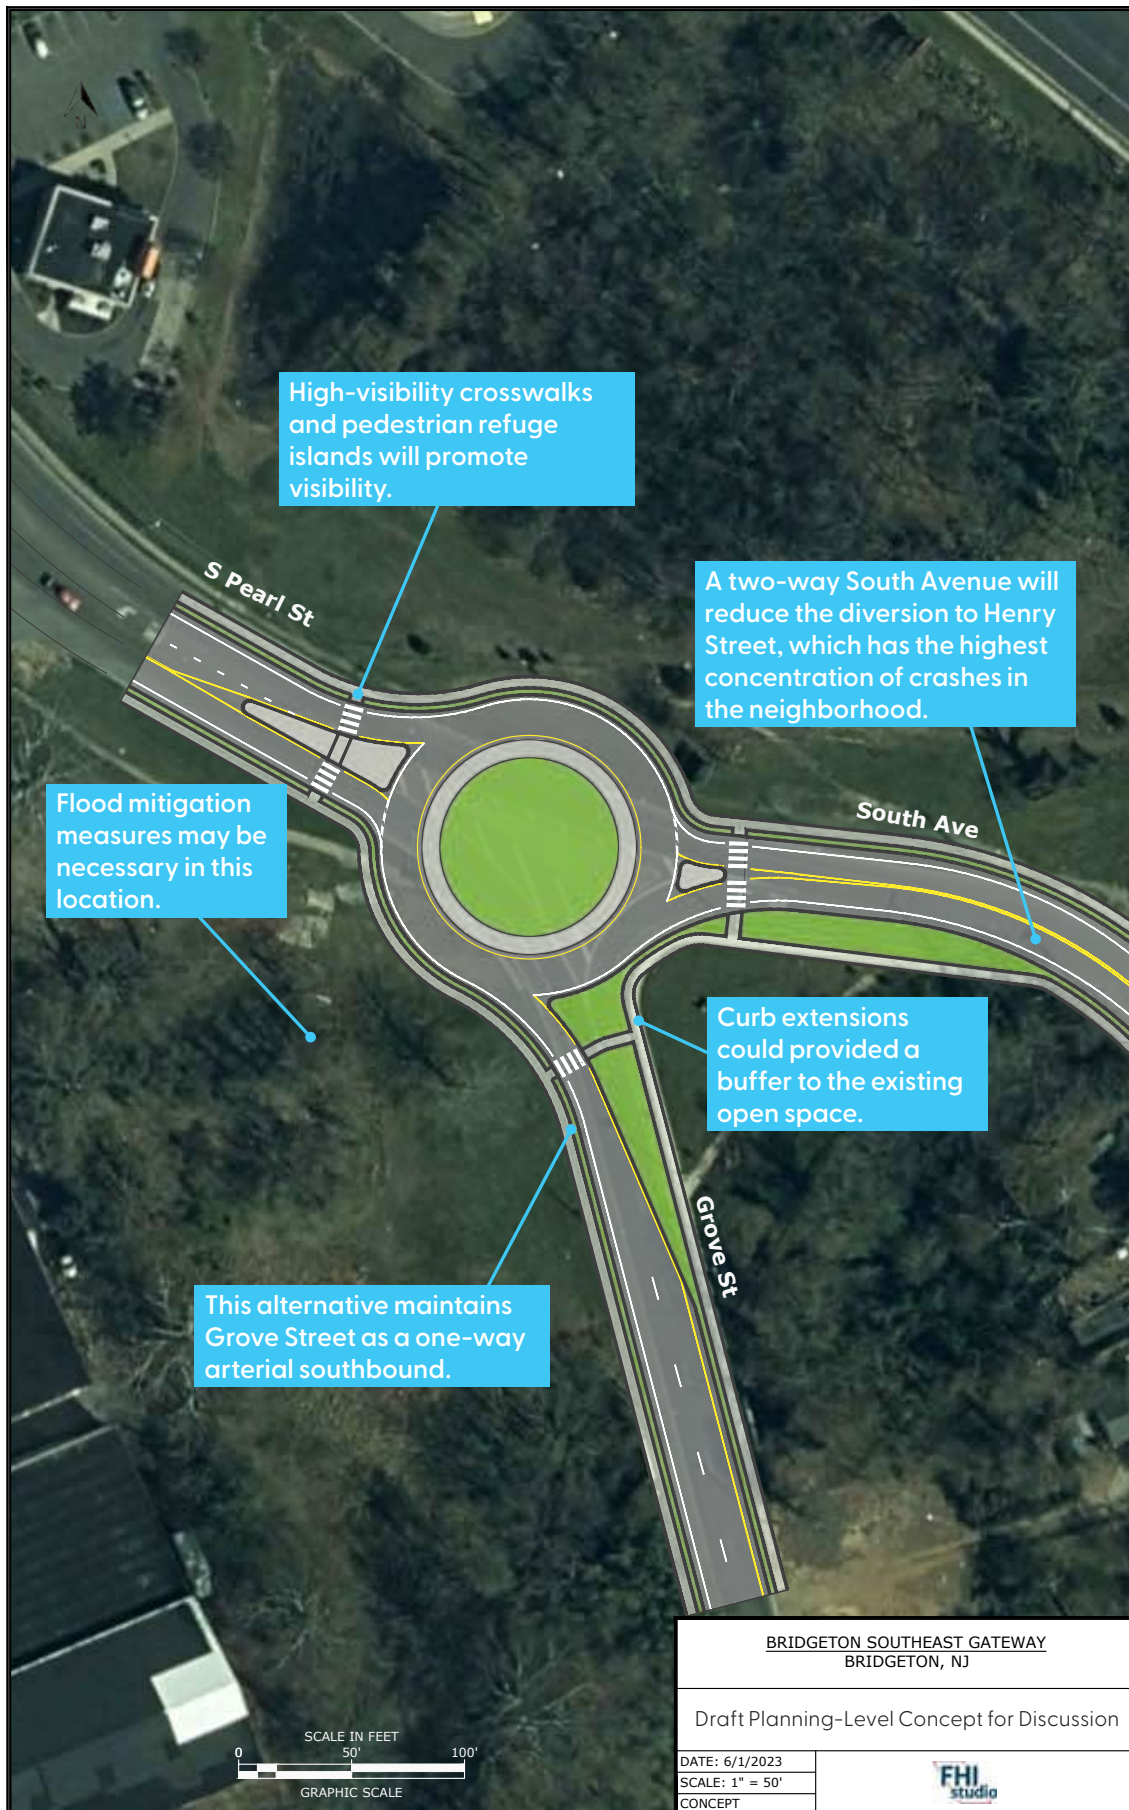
Grove St at S Pearl St And South Ave One-Way Couplet Concept Plan
